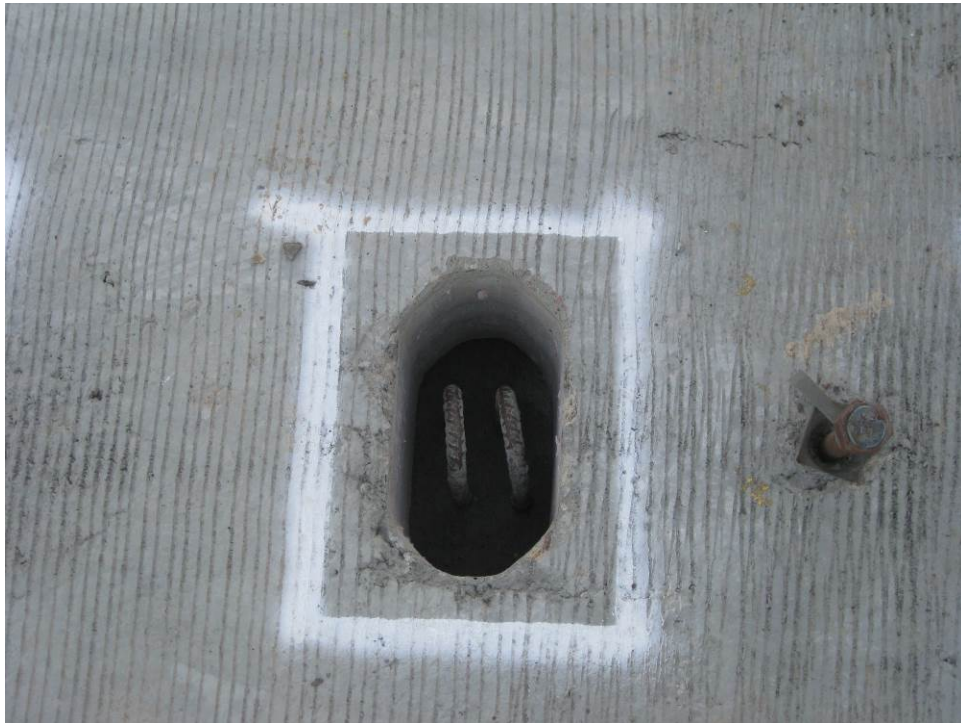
Close-up view of a deck panel shear pocket placed over reinforcement from the girder. Deck-girder composite action is obtained when the shear pocket and underlying haunches are filled with the UHPC.
